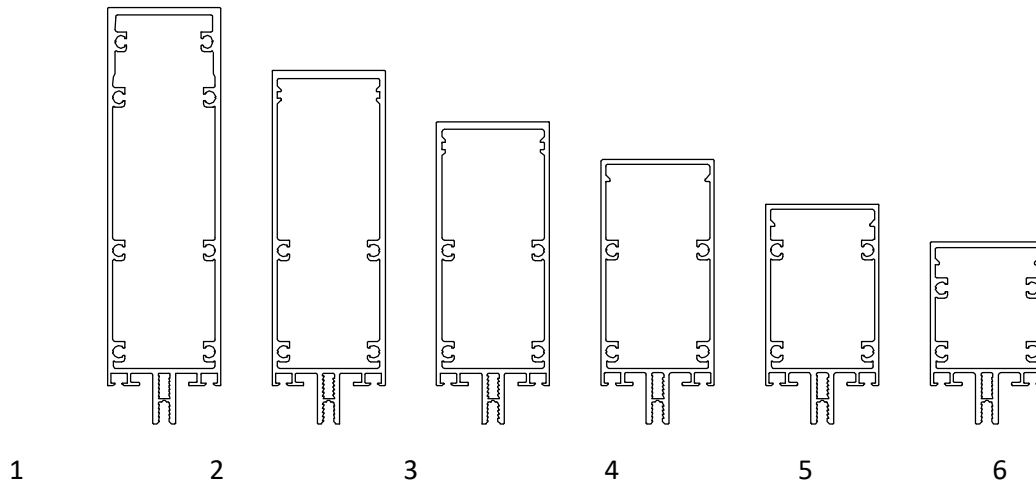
Examples of typical aluminium profiles for curtain walls and windows
